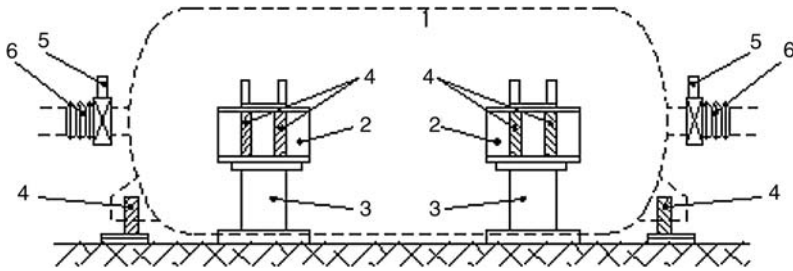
General layout of the earthquake protection system: 1, tank; 2, spring and viscodamper units; 3, tank legs; 4, mechanical fuses; 5, protection gate valves; 6, fragile aluminum tubes
